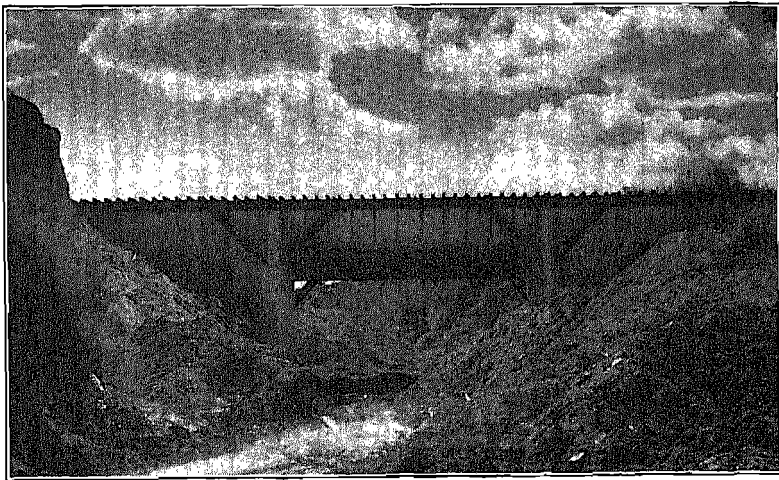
Large metal flume over wash, near Price, Utah. Steel substructure set on concrete piers. (Courtesy Soil Conservation Service.)
